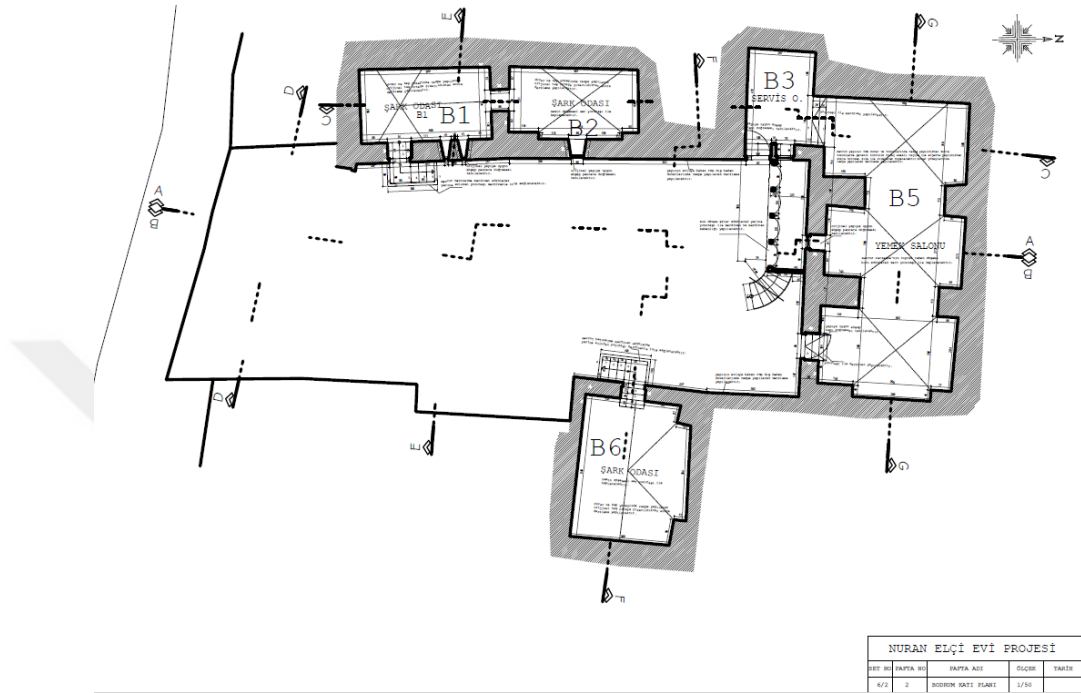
Nuran Elçi mansion restoration project basement floor plan (TEMA 2008: 50)
